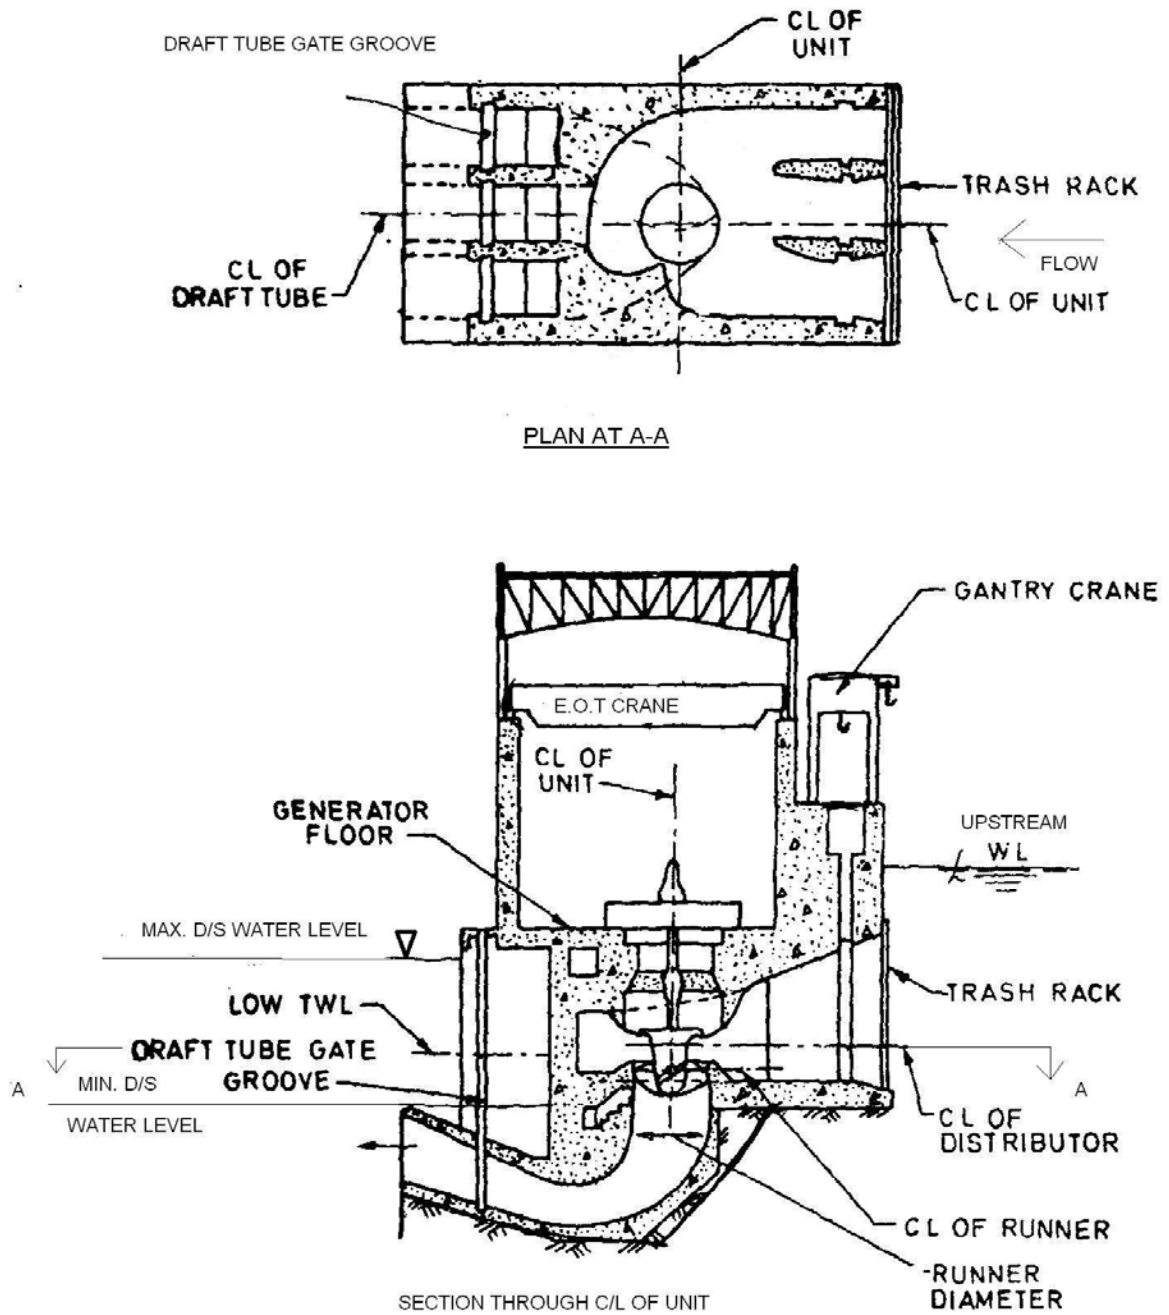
Canal / River Power House Intakes (Kaplan Turbines)
